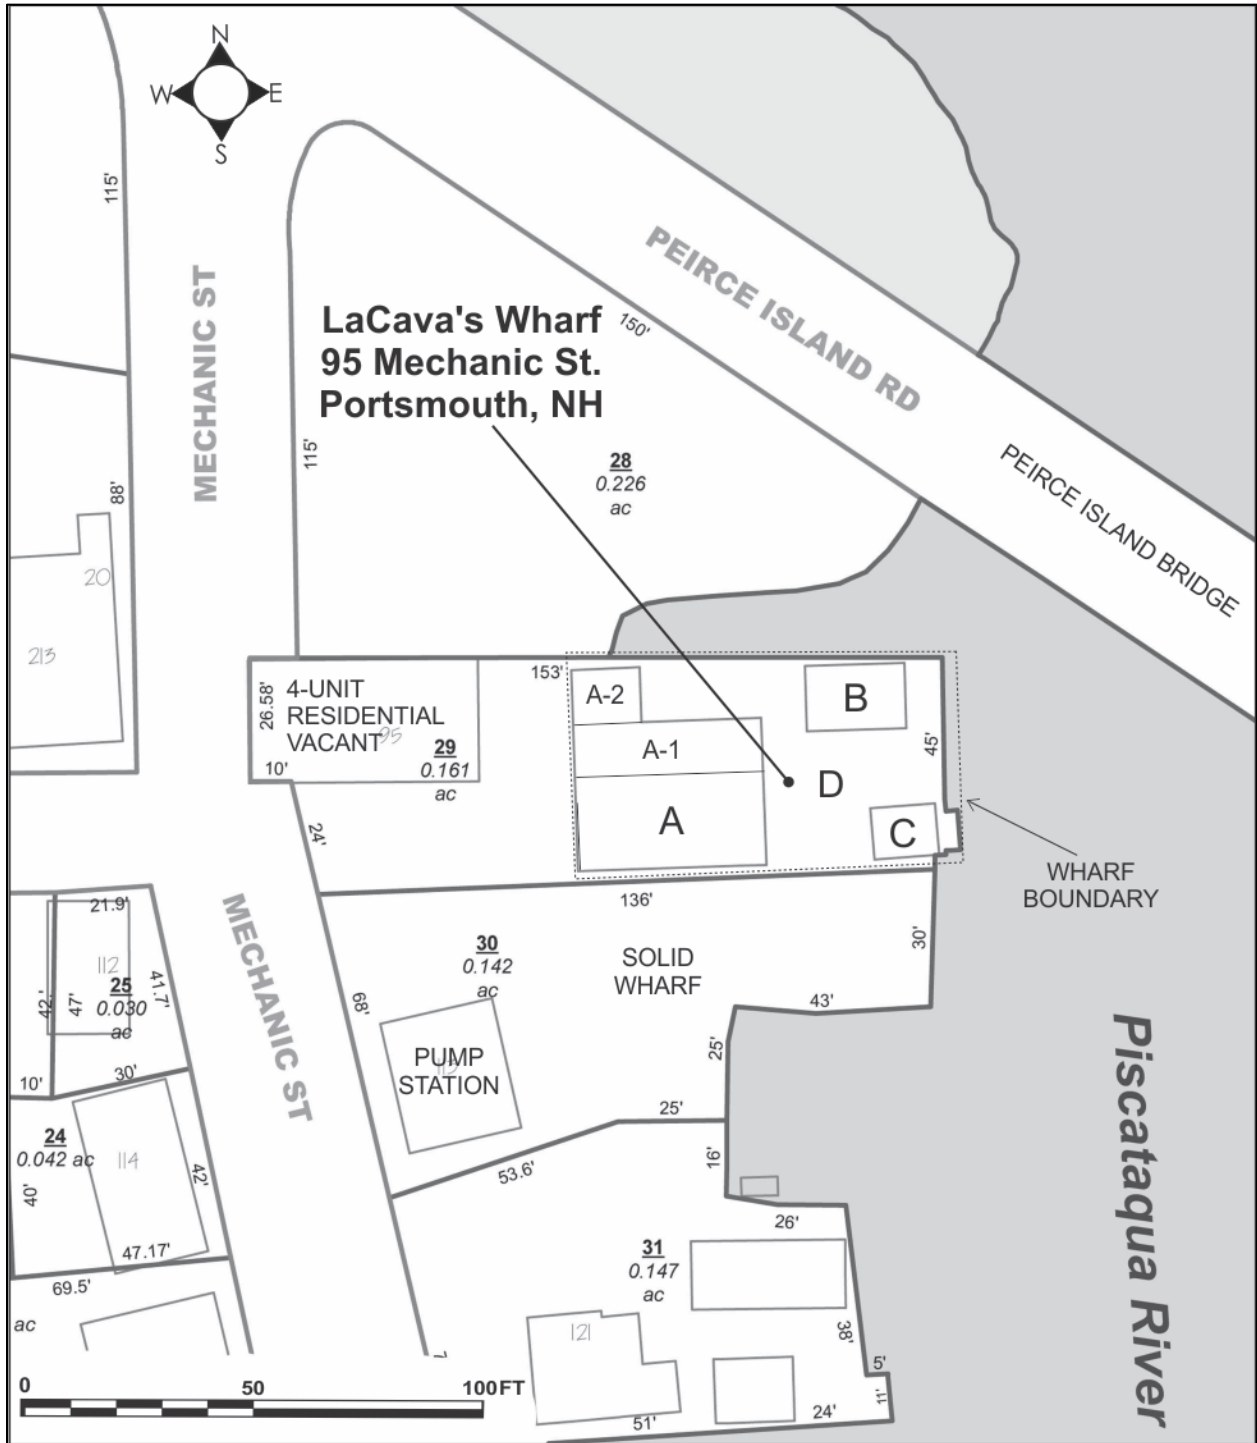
LaCava's Wharf site plan (Portsmouth NH Tax Map # 103).
